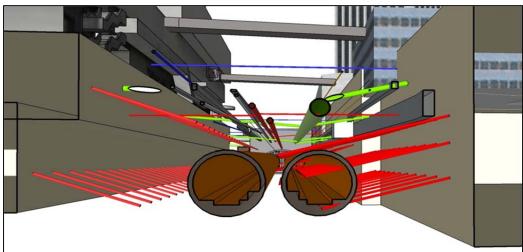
Open-Face Shield Tunnel Construction Through Flower Street Tie-backs (at SEM Cavern Interface with Twin Tunnels)
